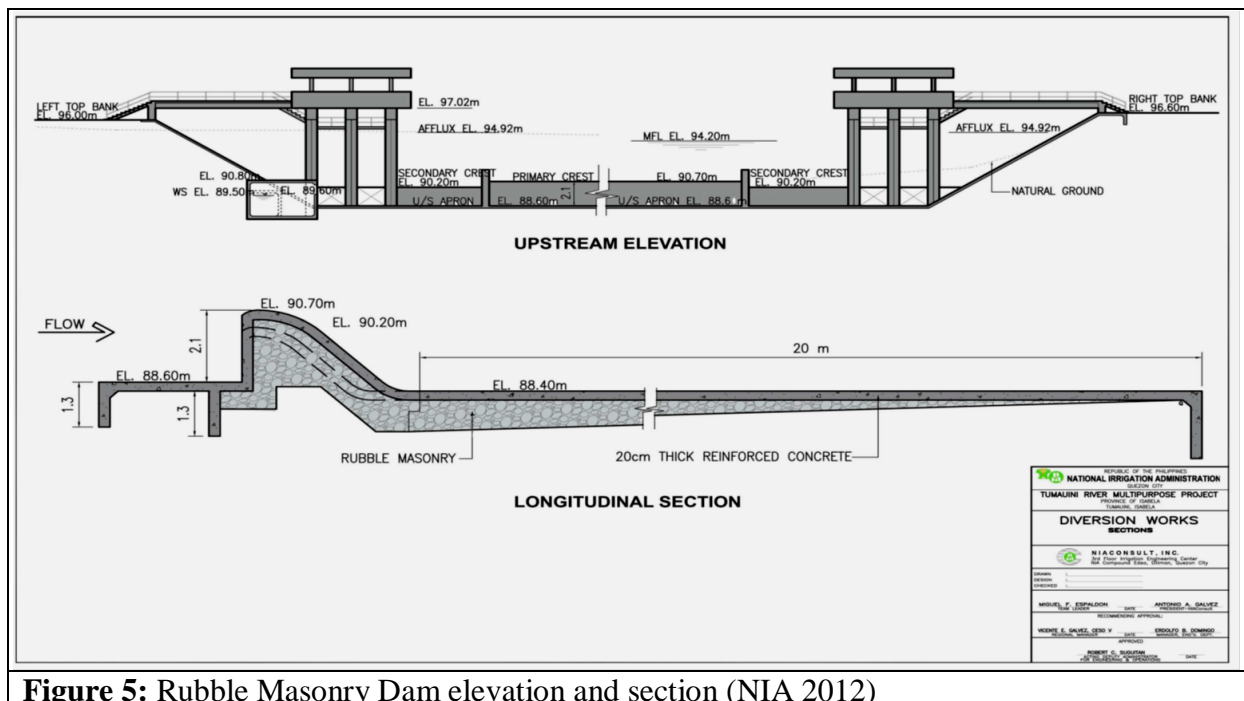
Rubble Masonry Dam elevation and section (NIA 2012)
